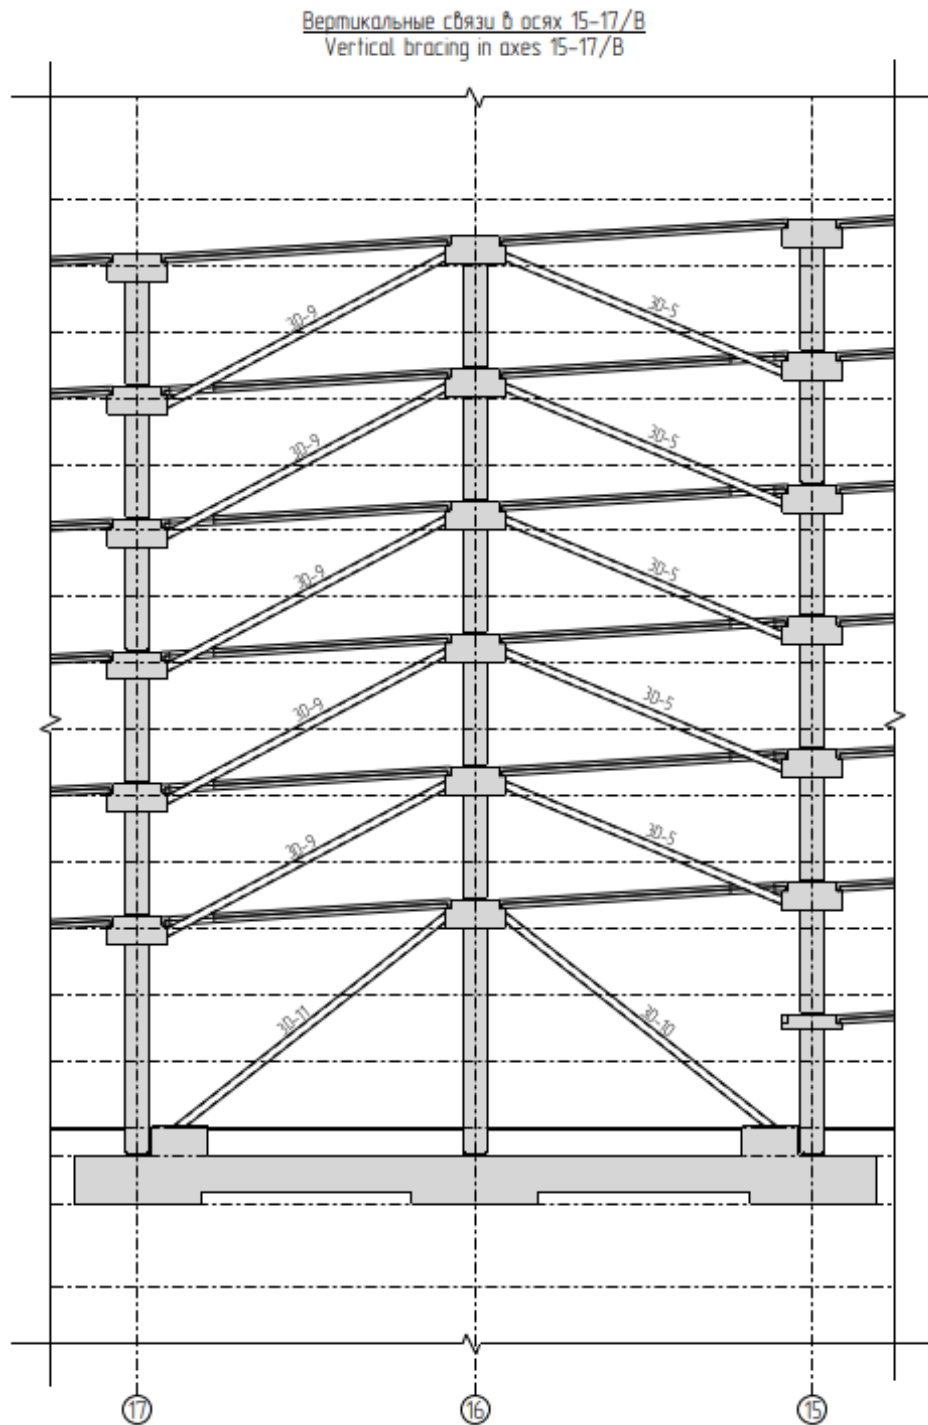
Extract from the layout drawing of steel brace support structure (Retrieved by KZh). Main view
